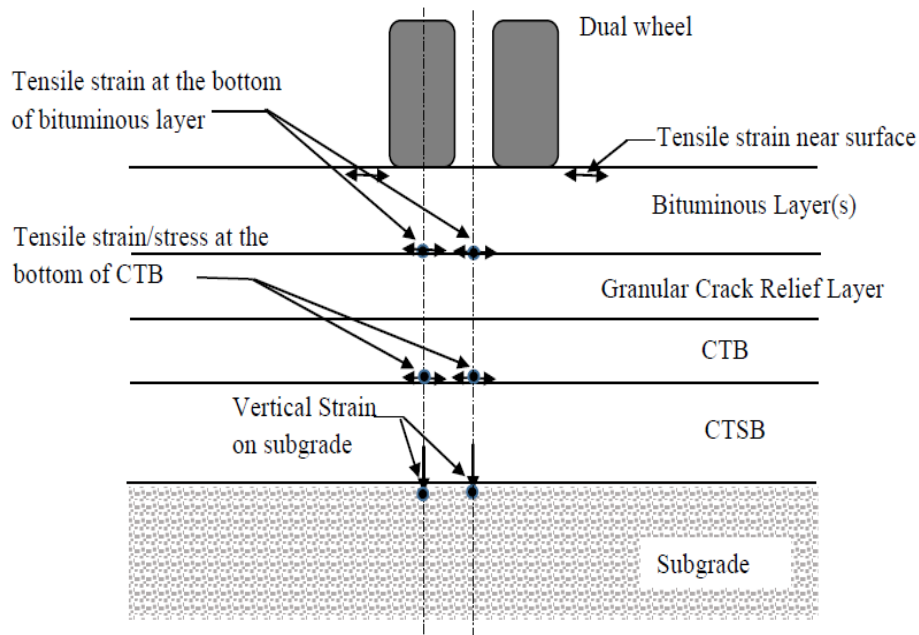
A pavement section with bituminous layer(s), granular crack relief layer, CTB and CTSB showing the locations of critical strains. (IRC: 37-2018)
